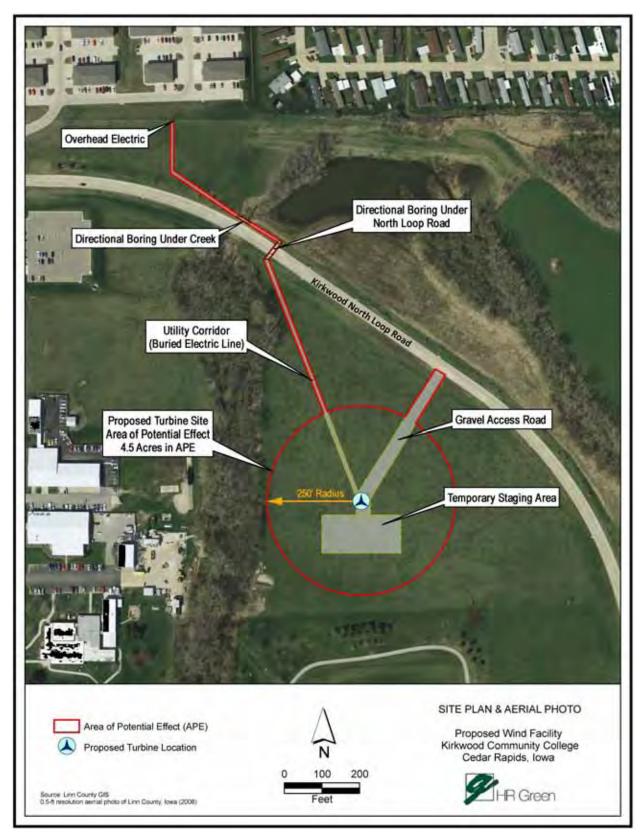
Kirkwood Community College Wind Turbine Project Site Plan
